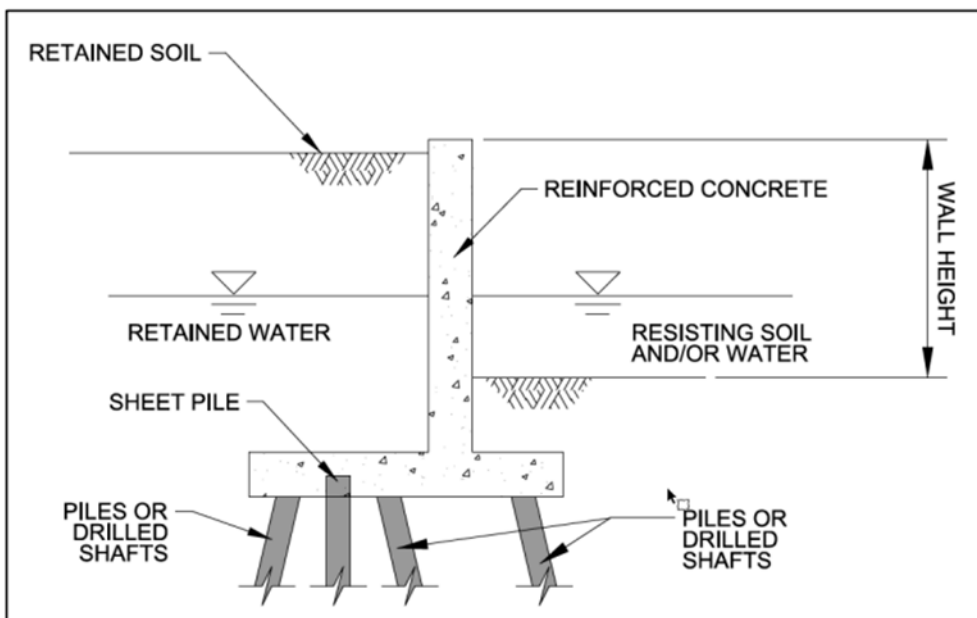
T-Wall Supported by Deep Foundation (USACE, 2022)
